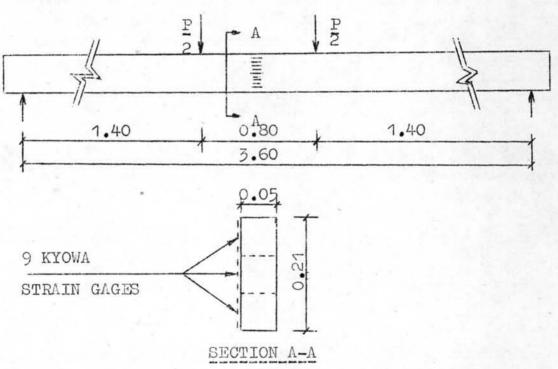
Detail sketch of a typical beam specimen showing relative placement of strain gages.
